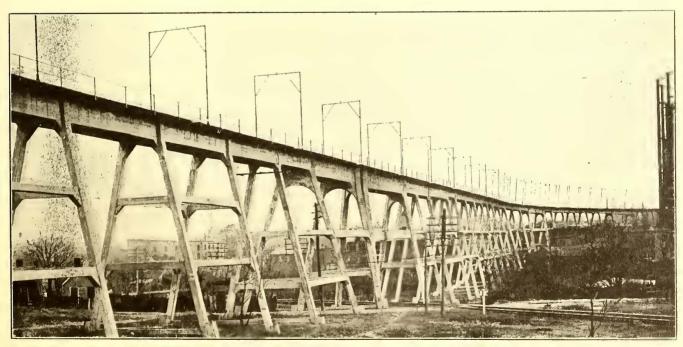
OVERHEAD CONSTRUCTION OF CONCRETE VIADUCT
